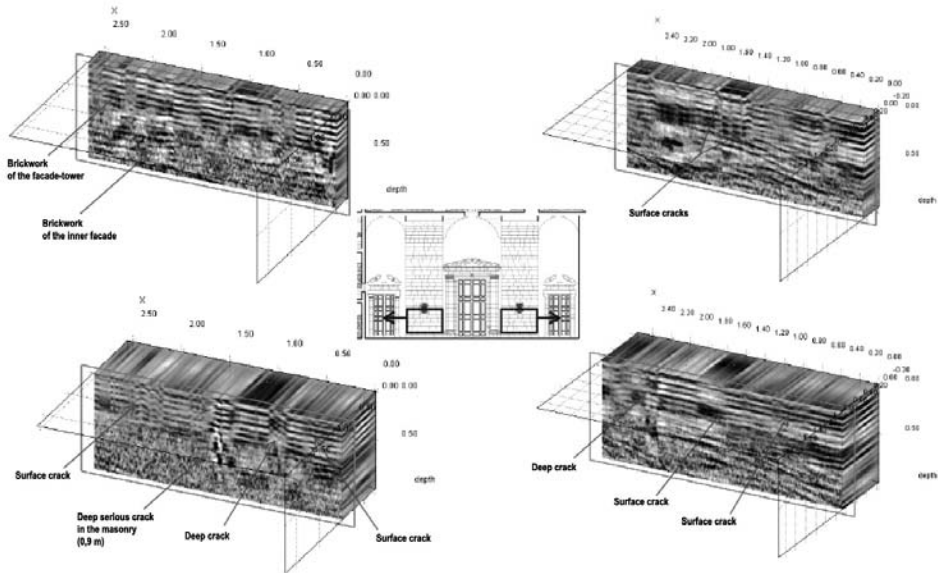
Comiso (Ragusa), Santa Maria delle Stelle church, three-dimensional radar prospecting in the gallery of the baroque façade-tower; non-destructive evaluation of the path and depth of the cracks in stone masonry.
